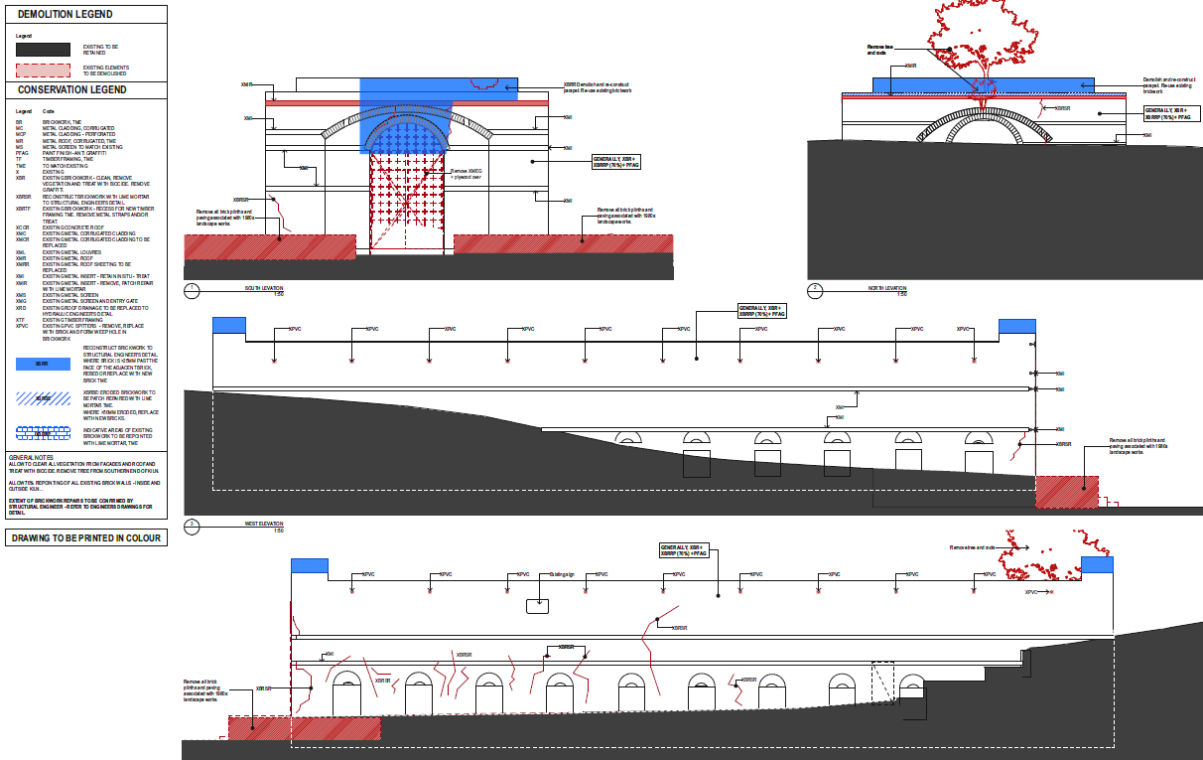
Proposed Down Draught Kiln 2 Conservation Elevations
